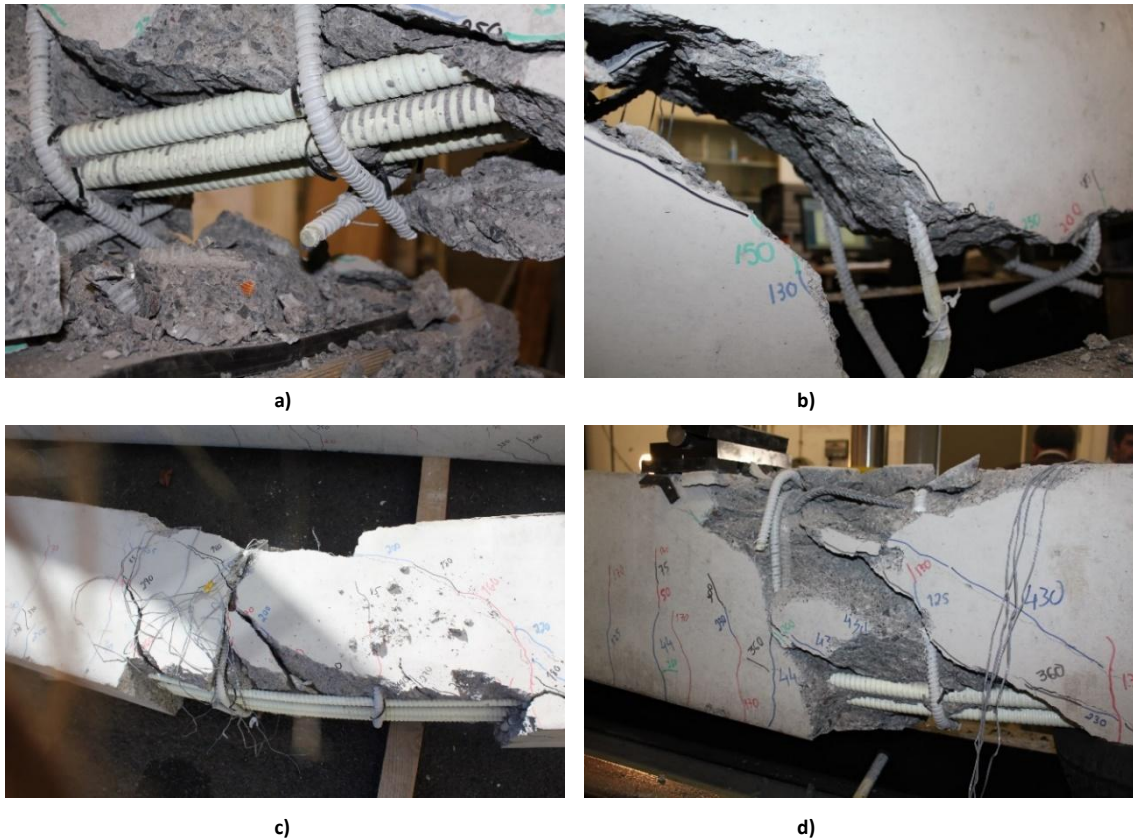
Comparison between C-stirrups and closed hoop stirrups: a) C-stirrups horizontal branch opening; C-stirrups disintegration; c) closed hoop stirrups behaviour at failure of one of the beams; d) closed hoop stirrups behaviour at failure
